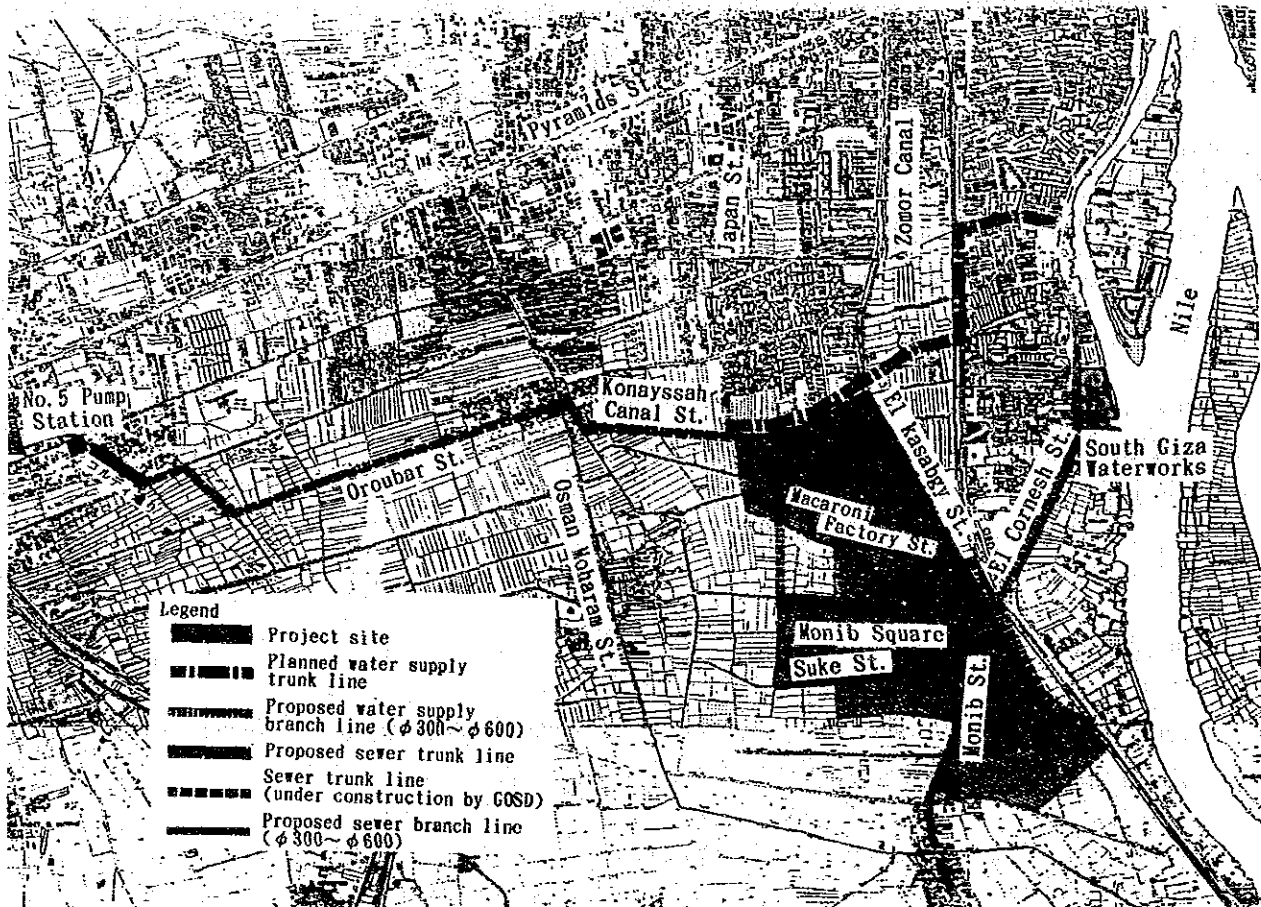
Proposed Main Water Supply and Sewer Facilities
